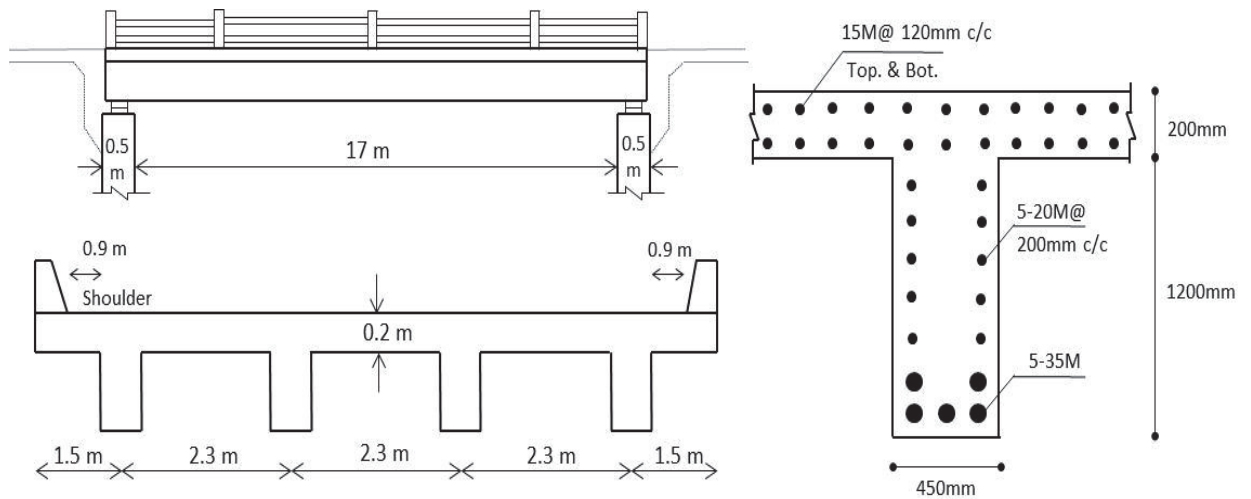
Geometry and Cross Section for the Case Study Bridge with 17.5 m span
